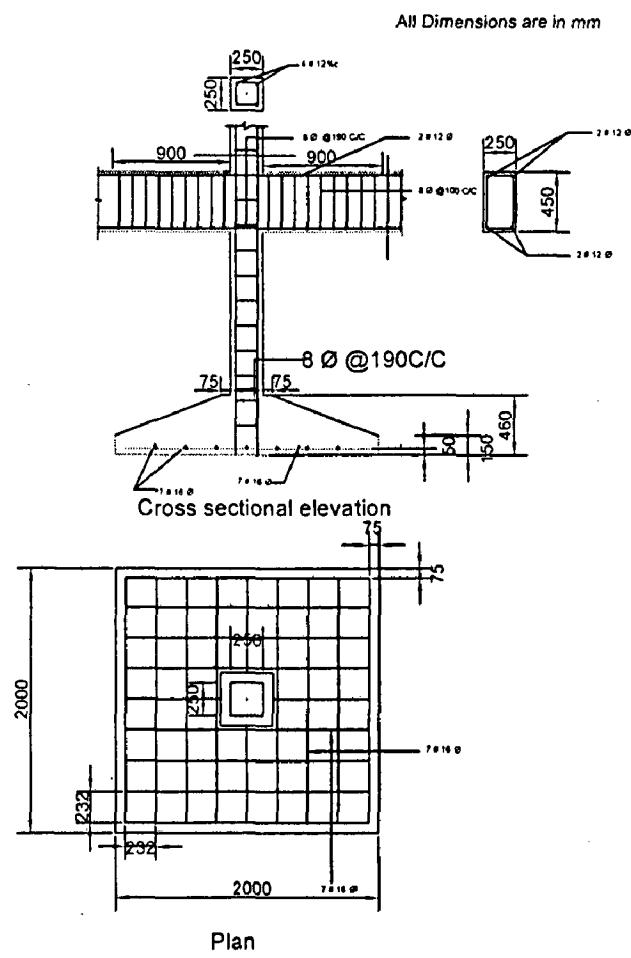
Details of beam and column reinforcement of interior frame for static case
